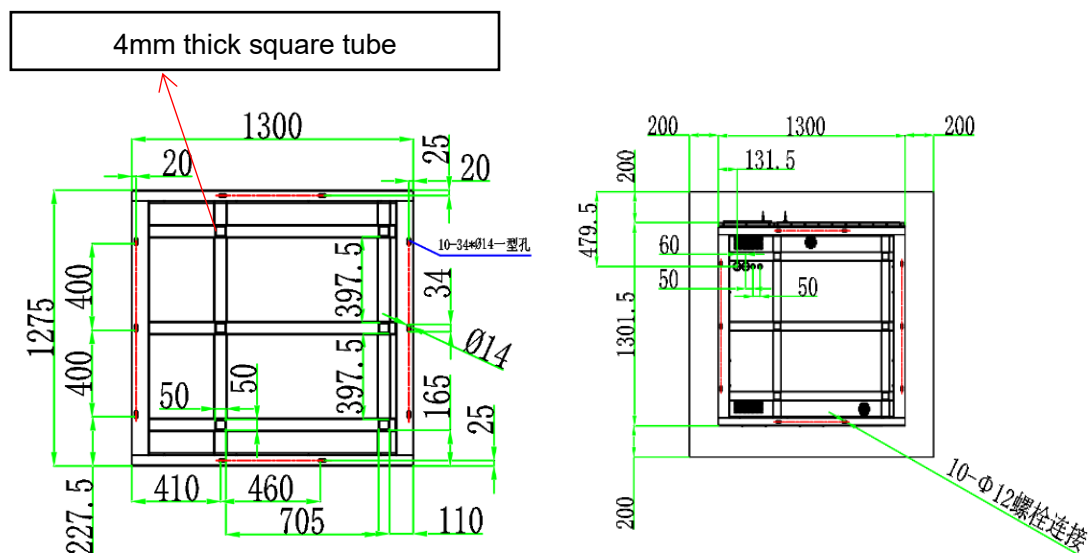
Schematic diagram of the structure and foundation width requirements for the bottom bracket of the cabinet (unit: mm)
